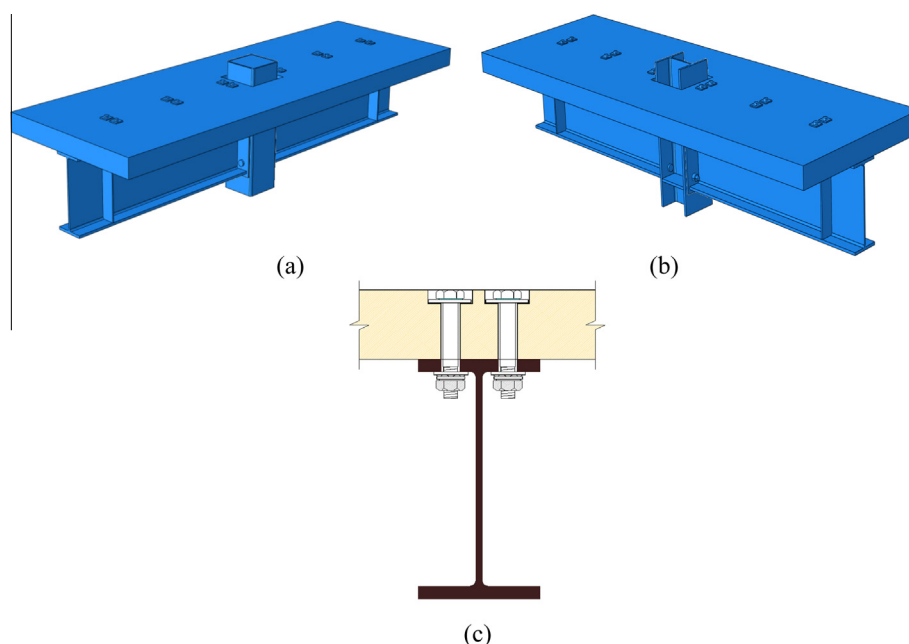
Schematic outline of deconstructable composite beam-to-column joint with flush end plate connection: (a) pictorial view of CJ1 and CJ2; (b) pictorial view of CJ3 and CJ4; and (c) bolted shear connection.
